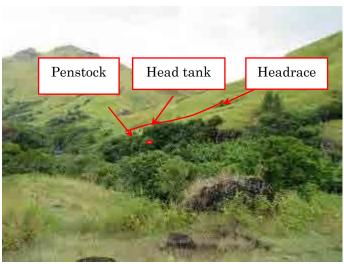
Condition of alternative powerhouse site, which is the downstream of original intake site
